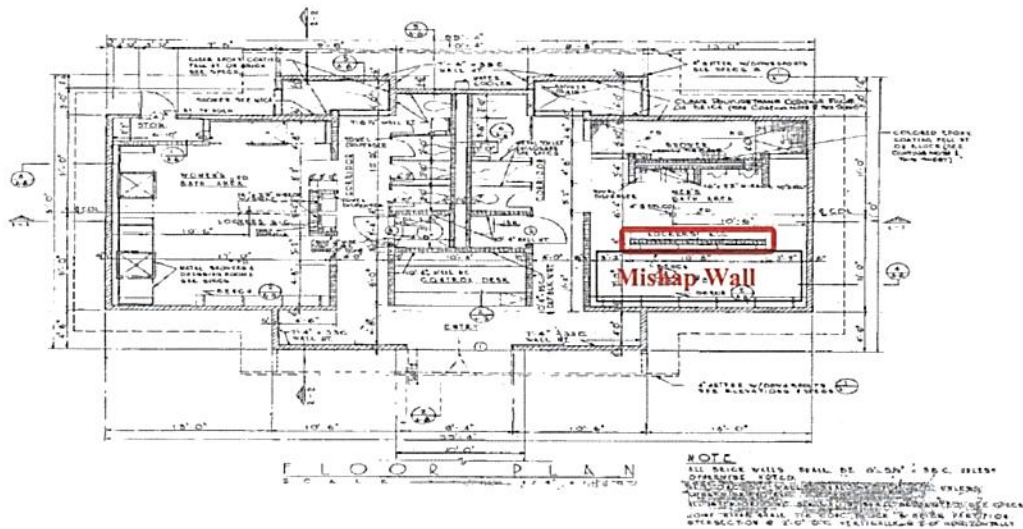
Bathhouse Floor Plan (Tab Z-18)
